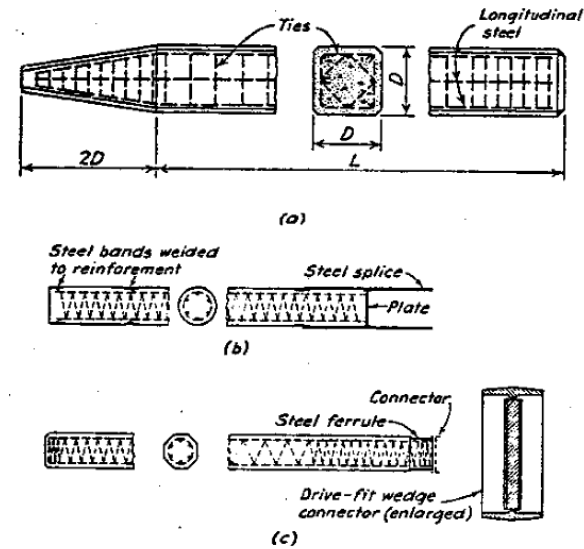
Examples of Precast Concrete Piles (Peck, Hanson and Thornburn, 1974: 206 cited in Burgess & Hulhaway, 1983: 150)
